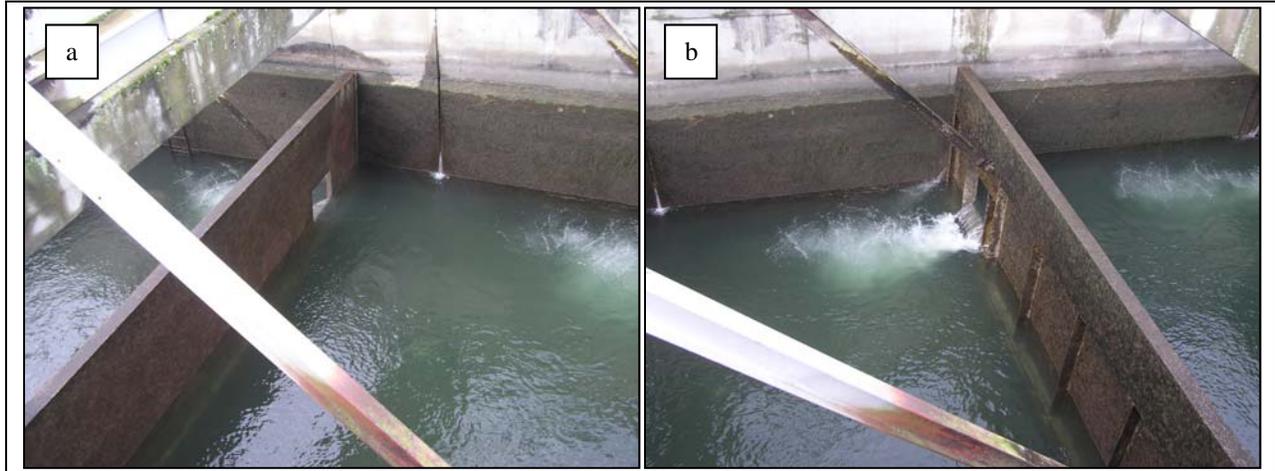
McNary North ladder tilting weirs. a. Downstream face of weir. b. Upstream face of weir. Images by D. Benner.
